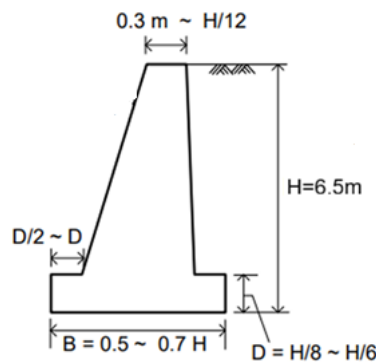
Typical dimensions of Riverbank Retaining Wall (BSN, 2017)
